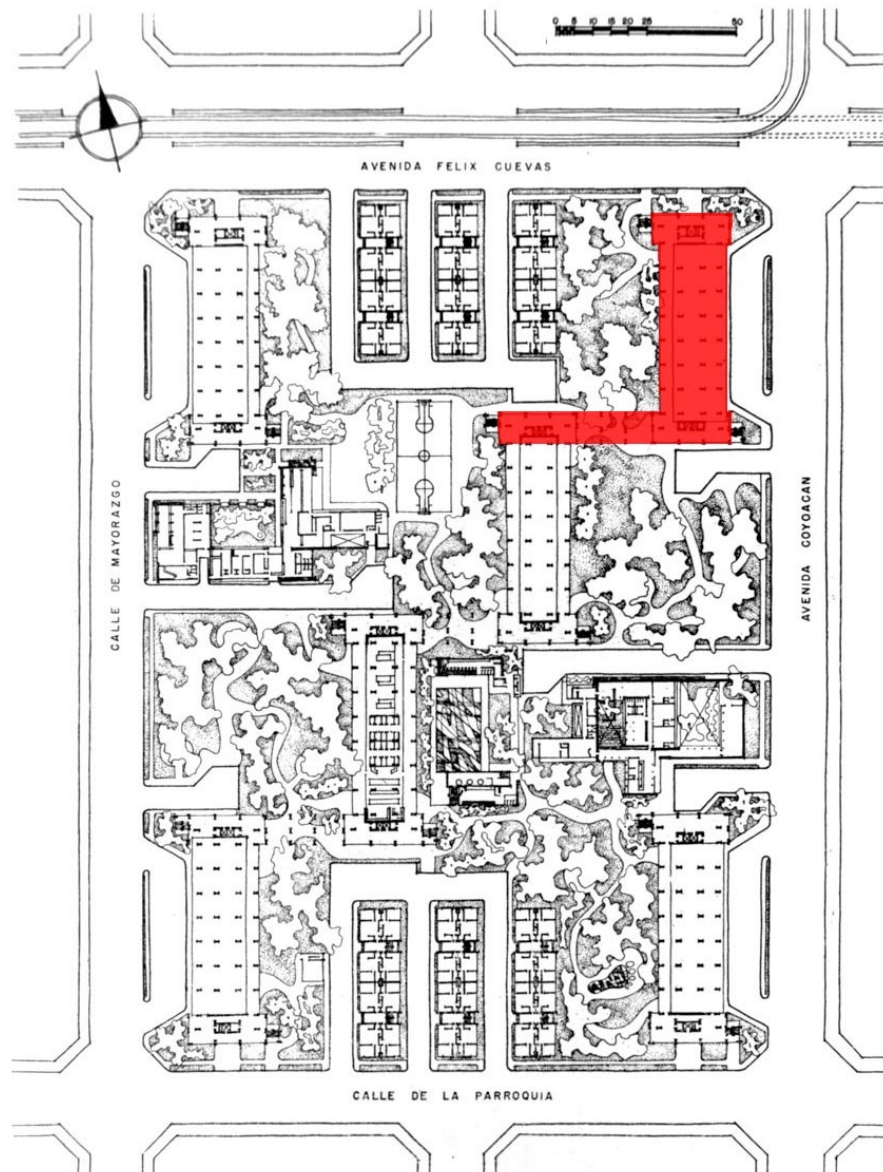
Two Zones per Floor Simulated for the Apartment Section of the Building.
